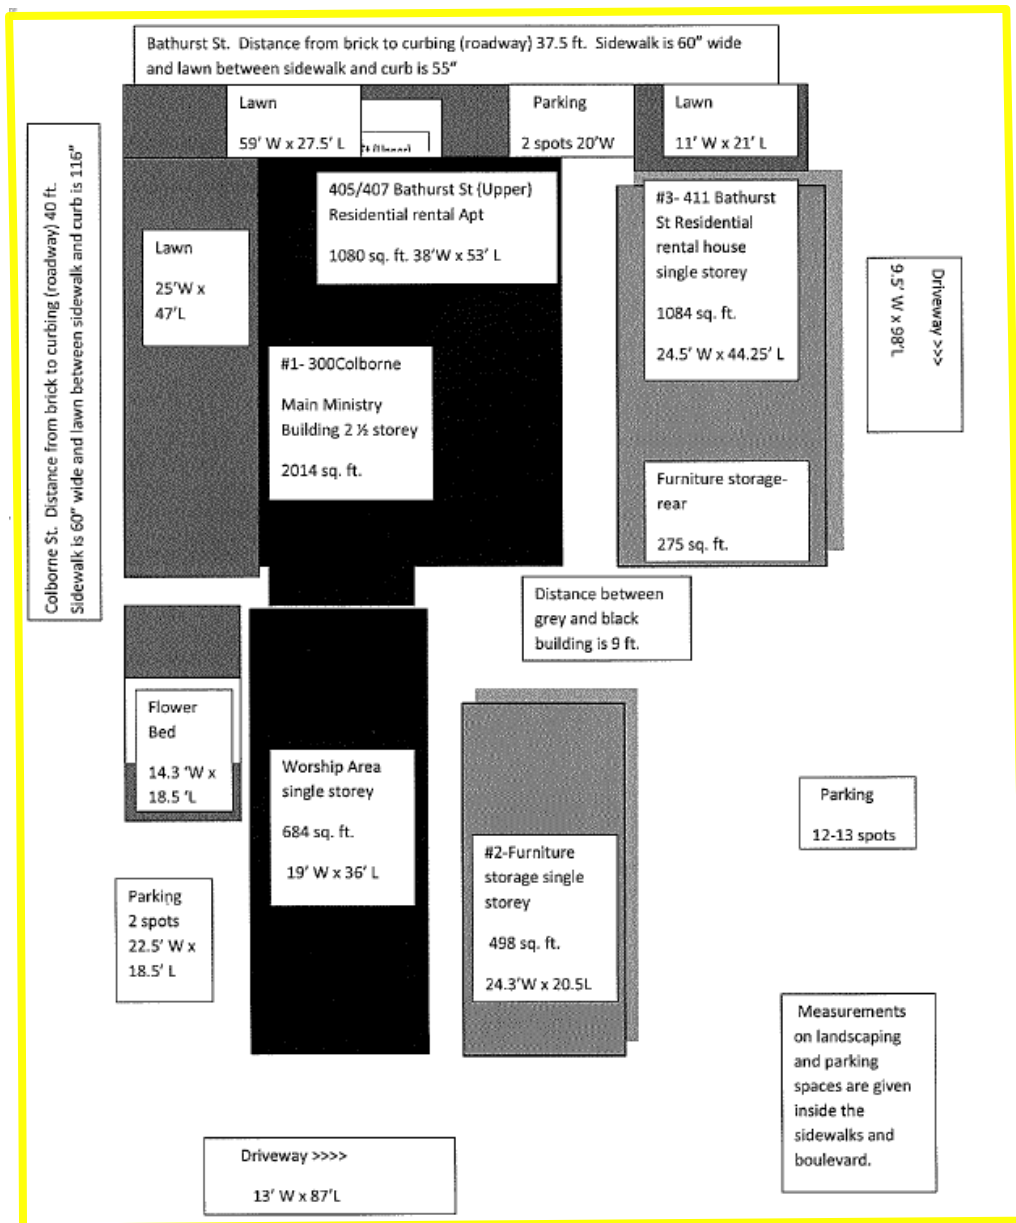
Depiction of Lot Configuration of Subject Site (provided by applicant)
